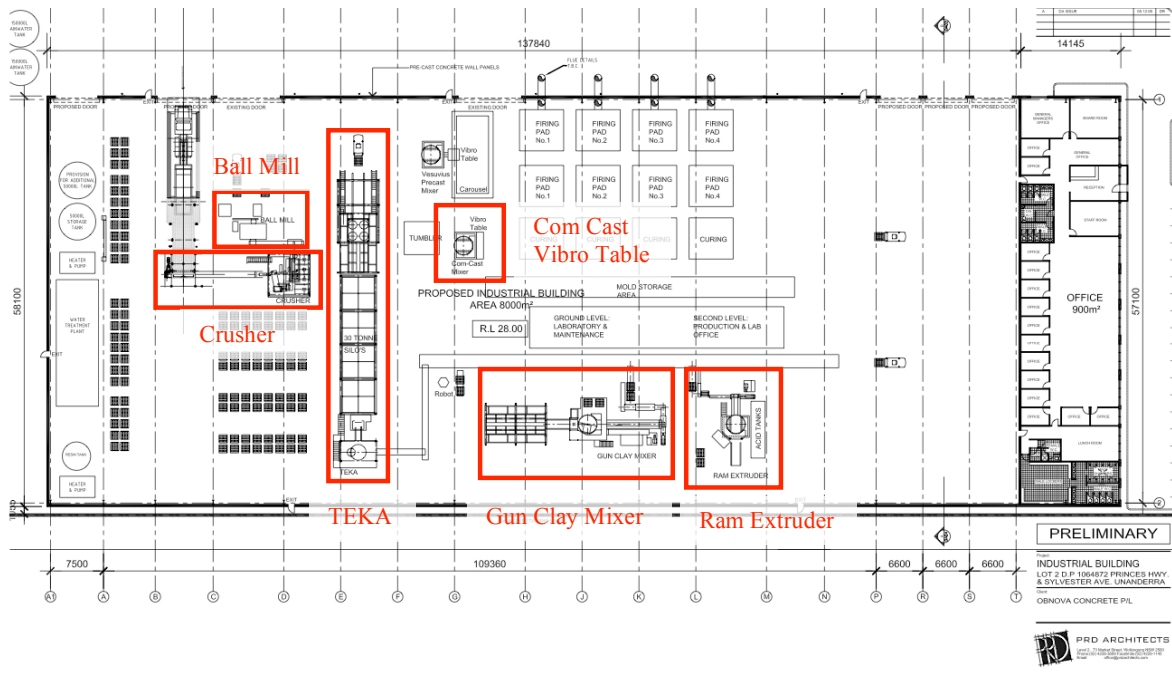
Indicative layout of primary noise-generating equipment in proposed building
